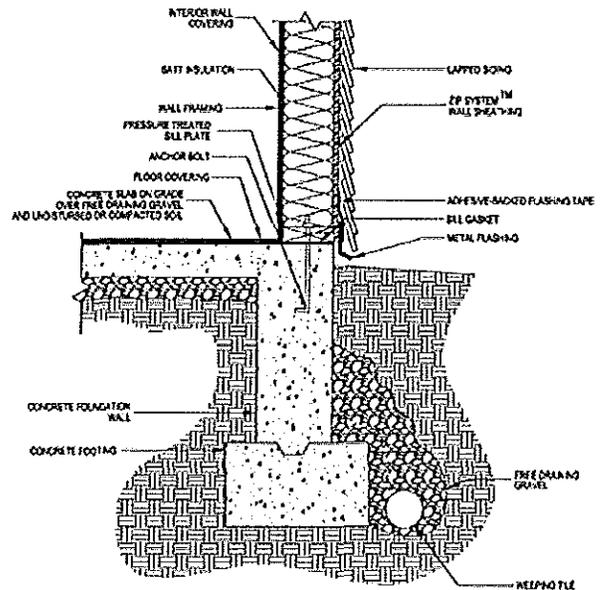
TYPICAL WALL-SILL INTERSECTION AND FLASHING DETAILS FOR LAPPED SIDING
